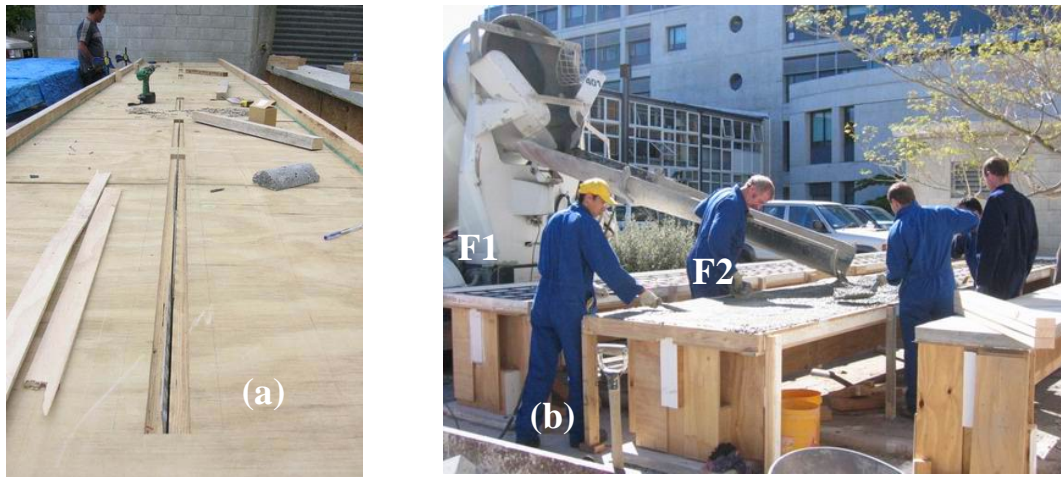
(a) Construction of formwork; (b) concreting beams F1 and F2
